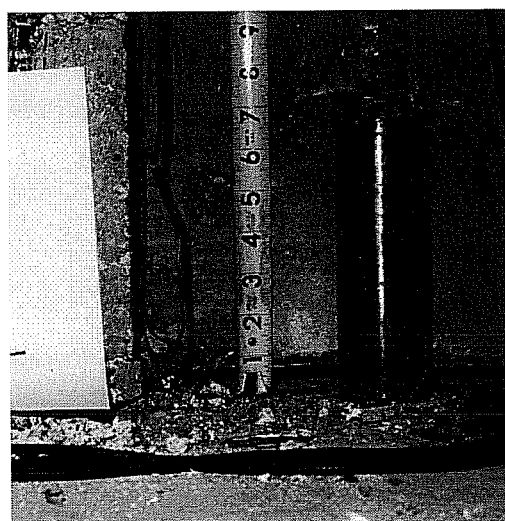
Maximum Crack Width During Test 1 (East Bars Shown)
